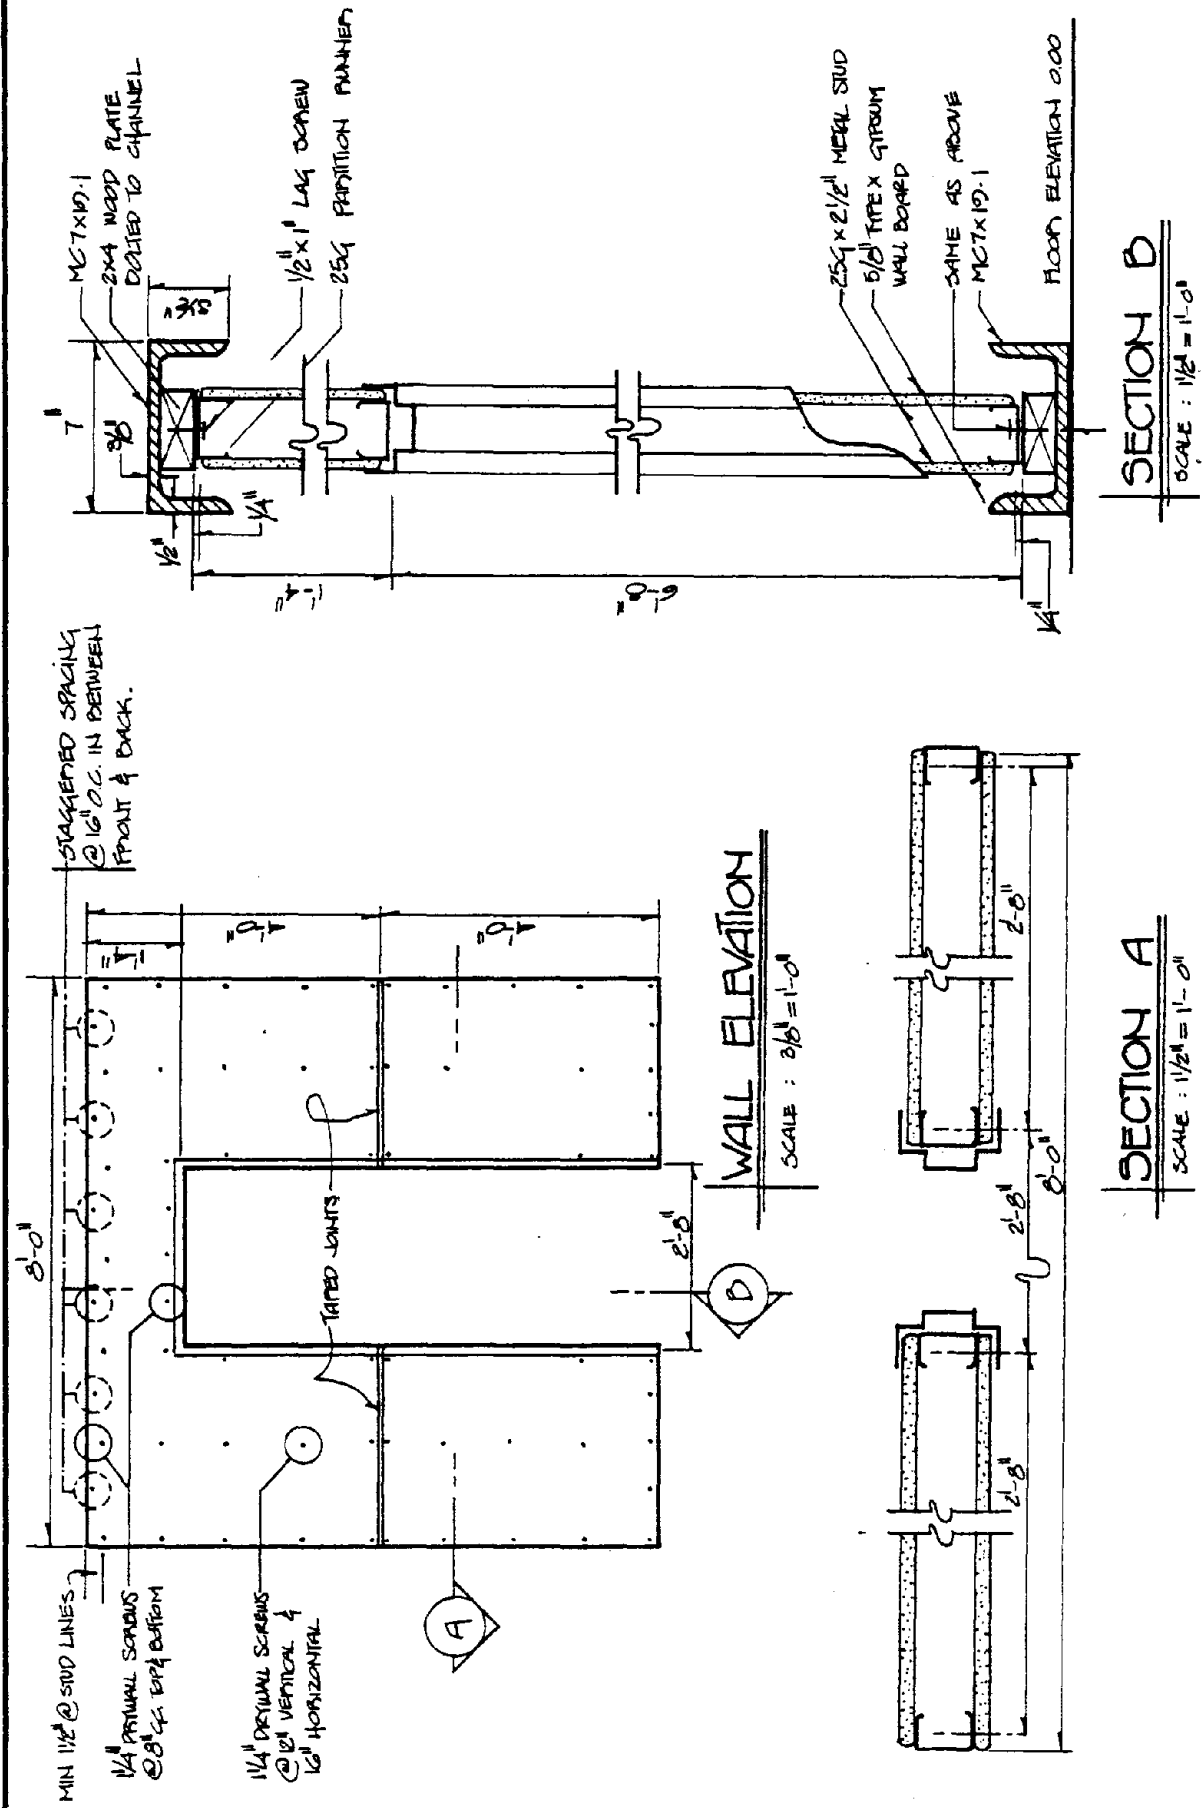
PARTITION TEST PANEL SPECIMEN P10.
